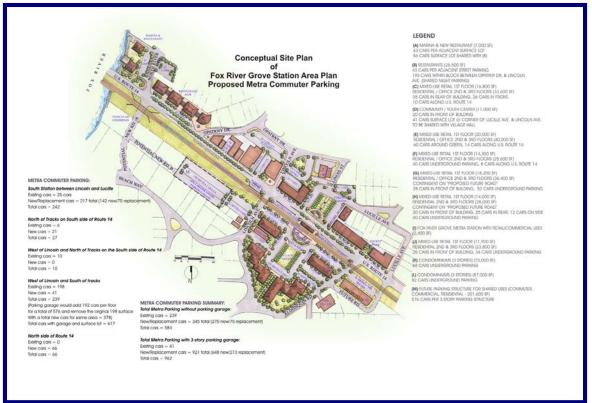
Station Area Plan with Proposed Metra Commuter Parking
